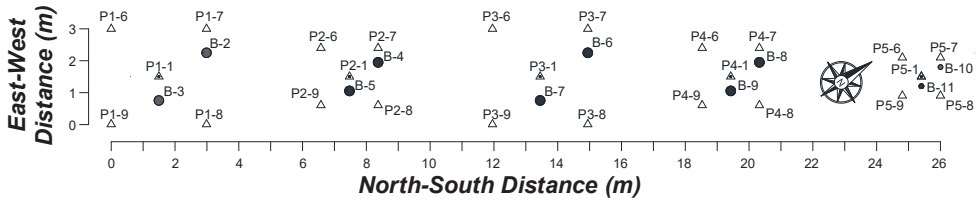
Plan view of the Hollywood test site showing exploration locations (modified from Bong and Stuedlein 2018).
